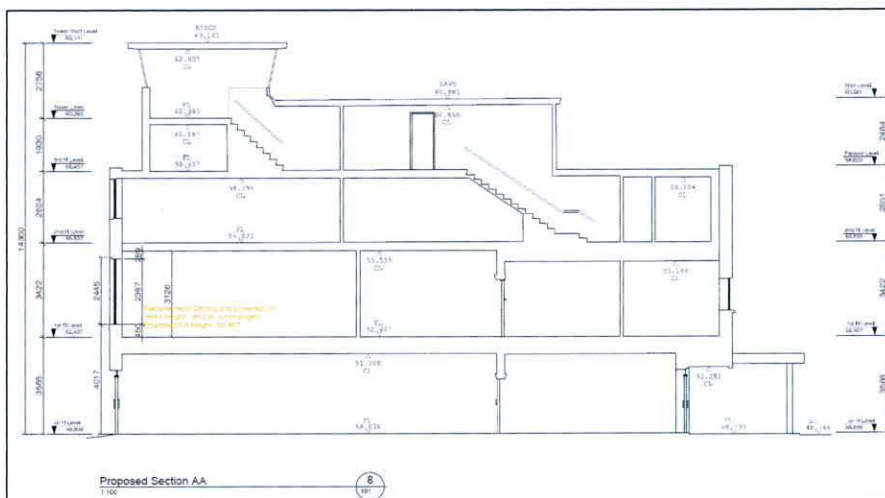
Drawing P937-101 Proposed Section (Source: NBK)
